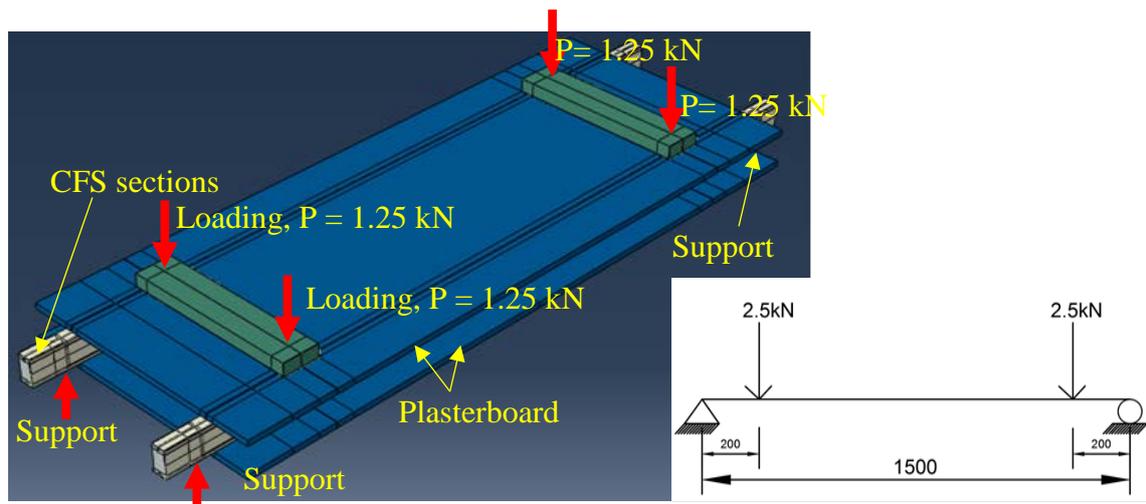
Load and boundary condition of a CFS wall panel with both sides plasterboard specimen1
